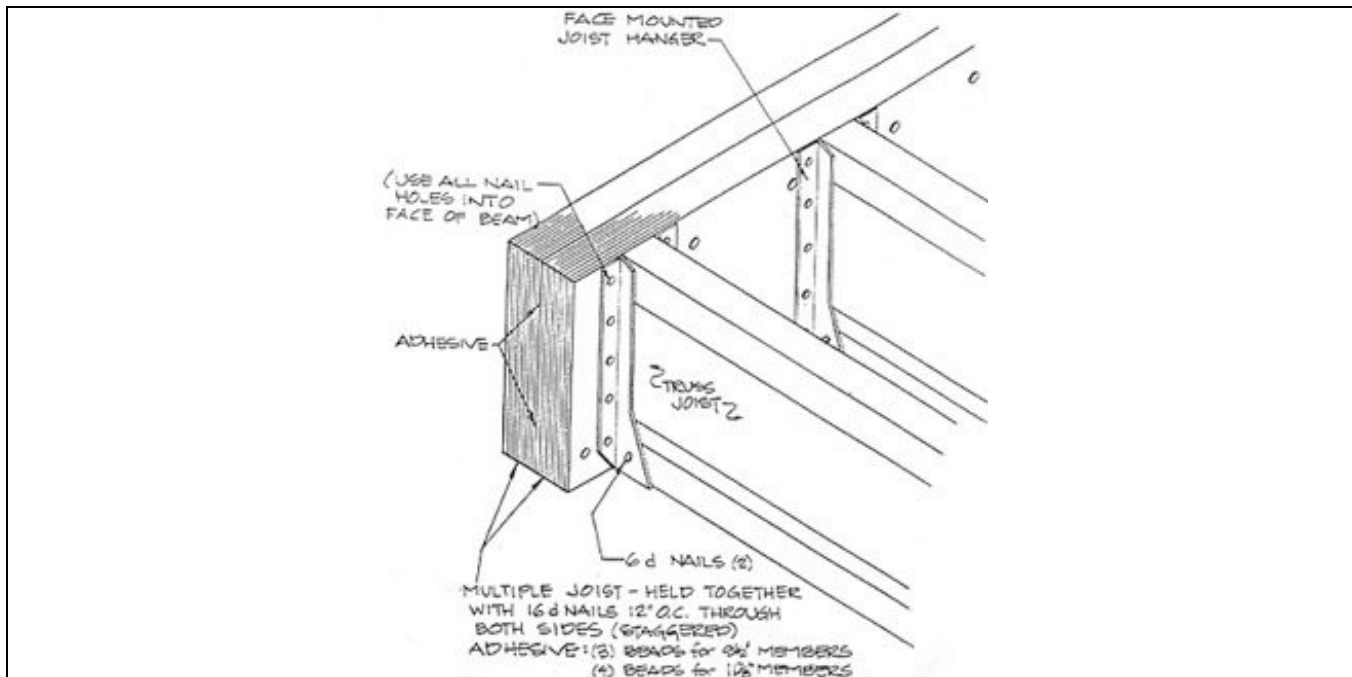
Securing Joists to Girders or Joist Headers: Joist hangers are attached to multiple joists just as they are attached to top splines. Follow the architect's plans and manufacturers installation instructions carefully for joist hanger specifications. Make sure multiple joists are laminated together as per manufacturer's recommendations.
